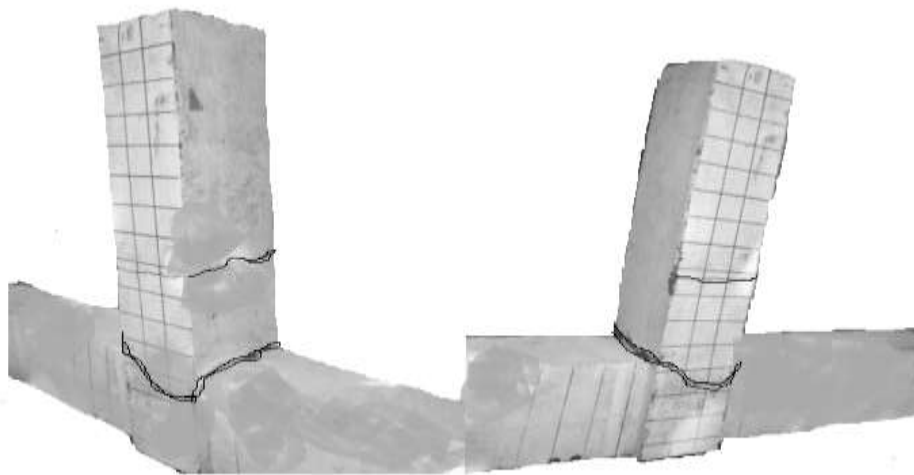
Tested sample Crack Patterns of Beam Column-Joint
